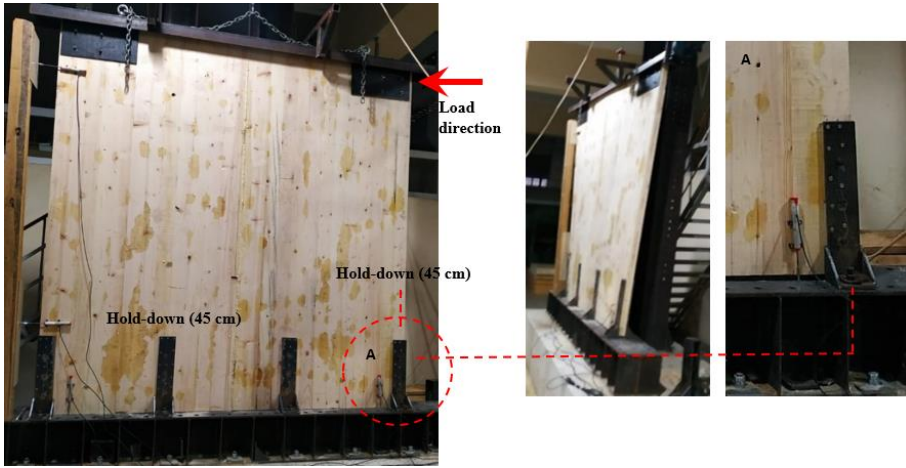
CLT wall to foundation Detail-3 and deformation of connections
